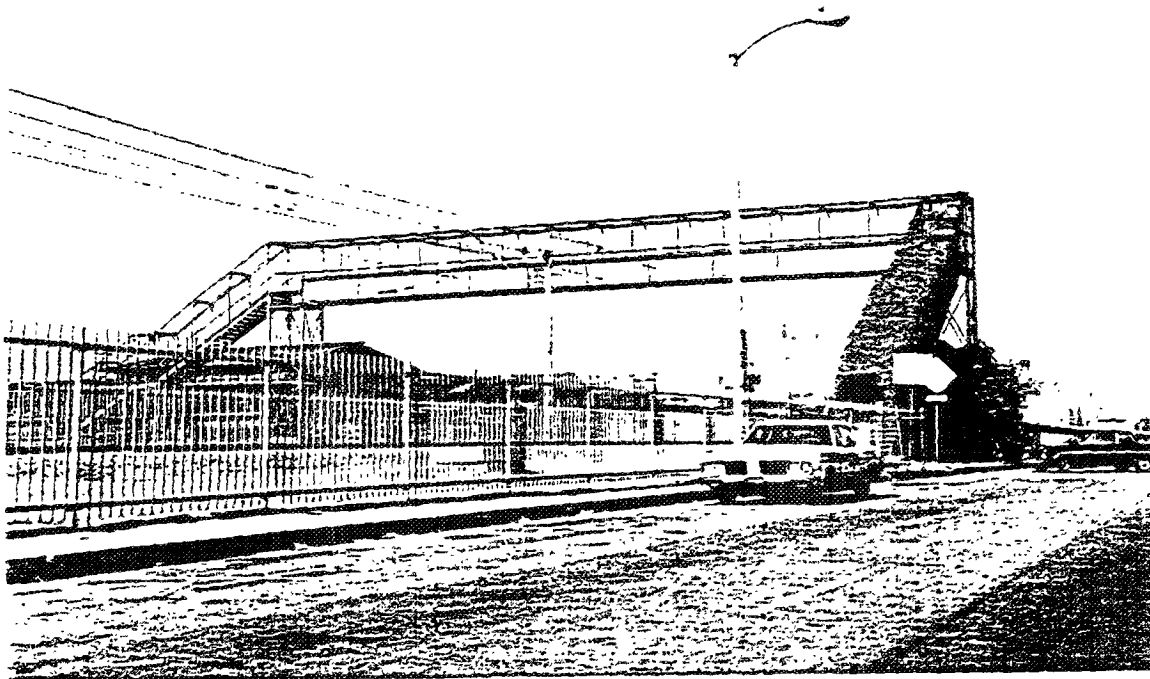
Florence station: North view showing a pedestrian bridge that appears to have been built previously.
